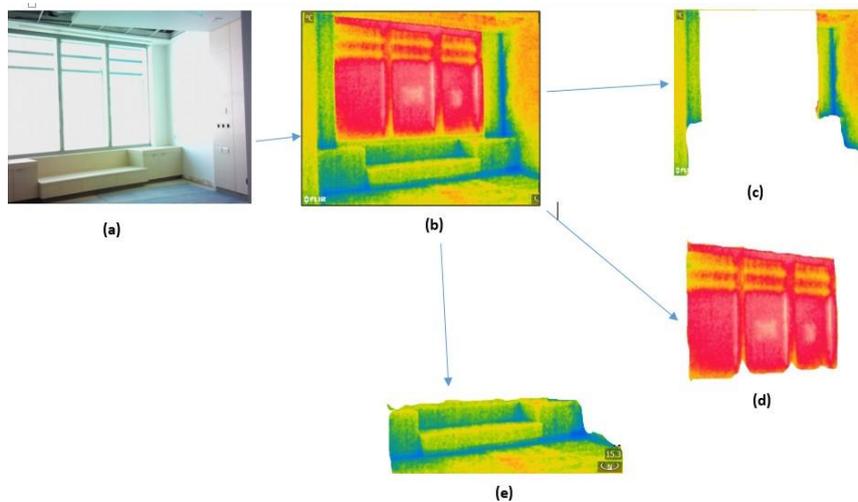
Texture extraction and feature labeling of an interior gypsum board wall and window in a thermal image
